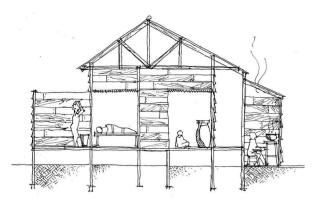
Section of modified IDP camp dwelling showing added hearth and bathing area
